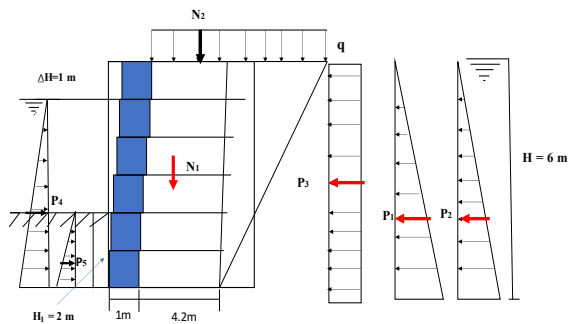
Wall detail with acting forces (tallest section facing waterways)
